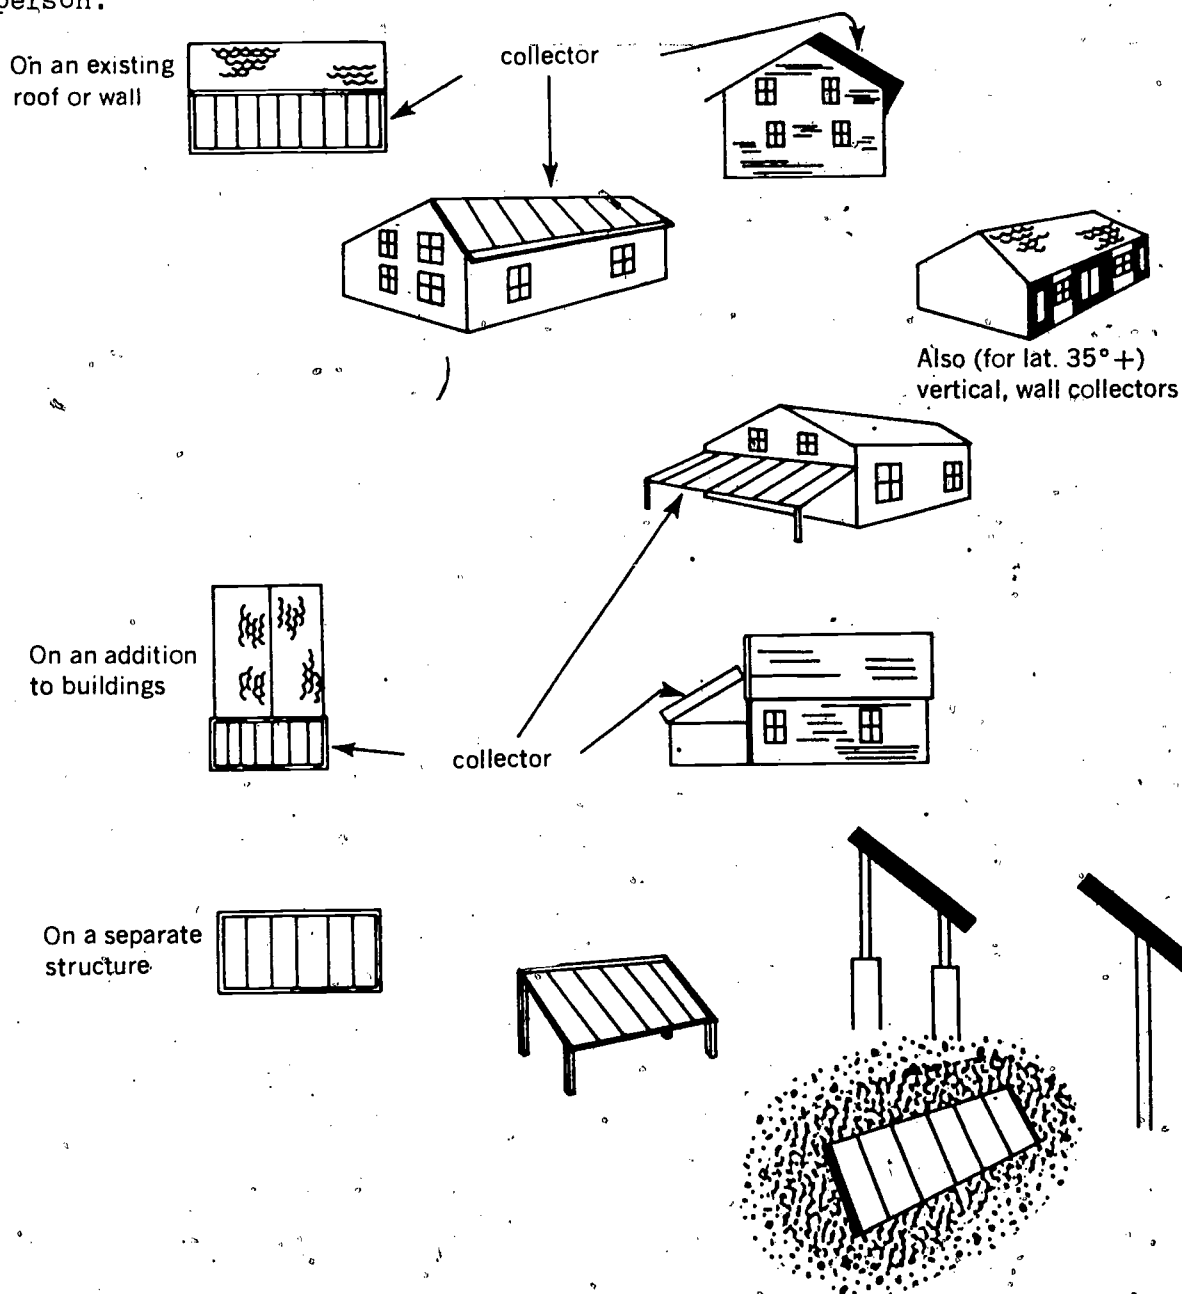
The Application of Solar Collectors to Existing Buildings.
